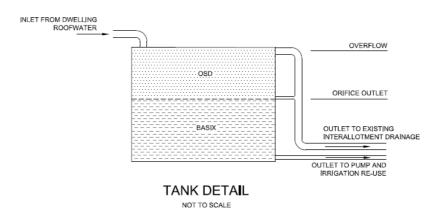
A Rainwater Tank with Three Outlets (after van der Sterren, 2014)
